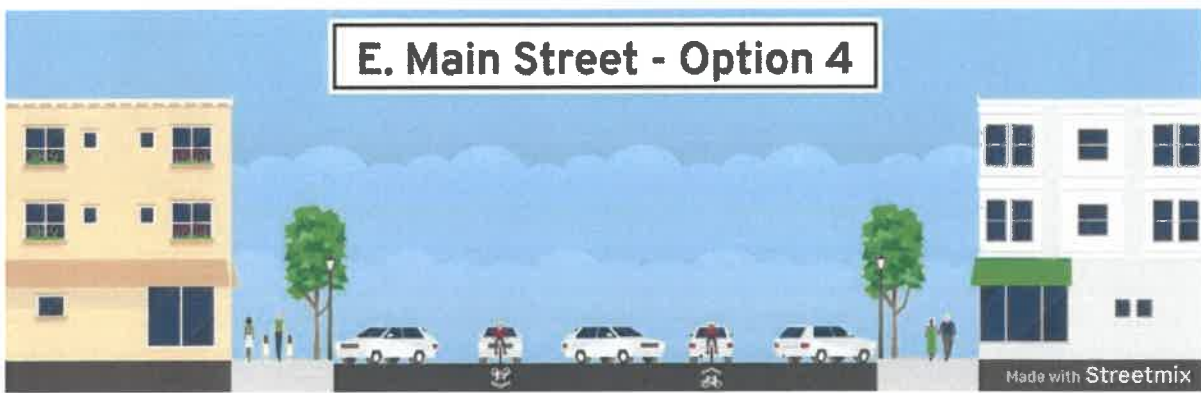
Downtown Streetscape Alternate Layout - Option 4
